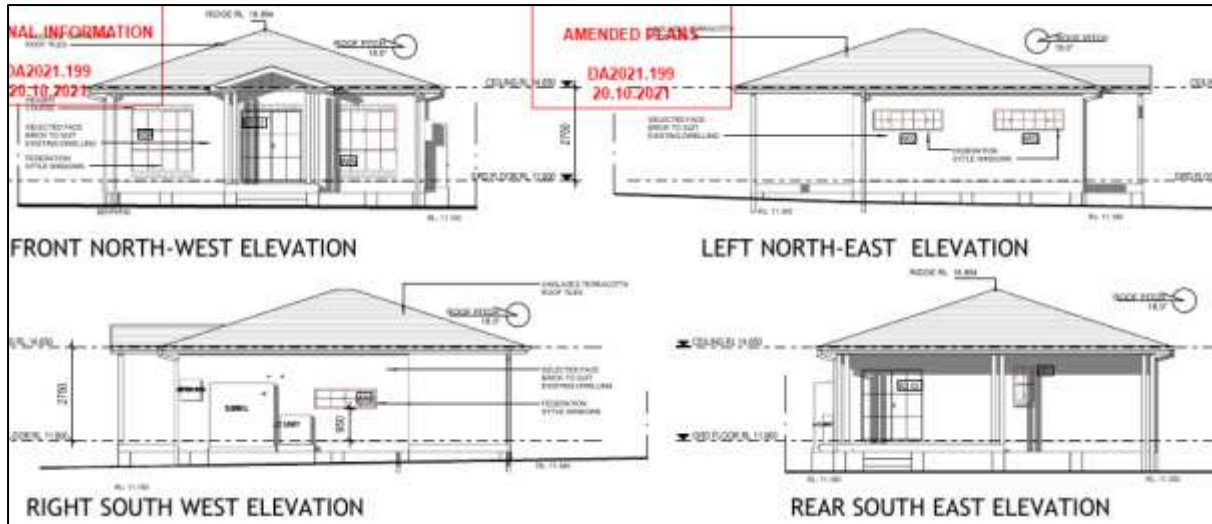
Extract of the proposed elevations of the secondary dwelling.
